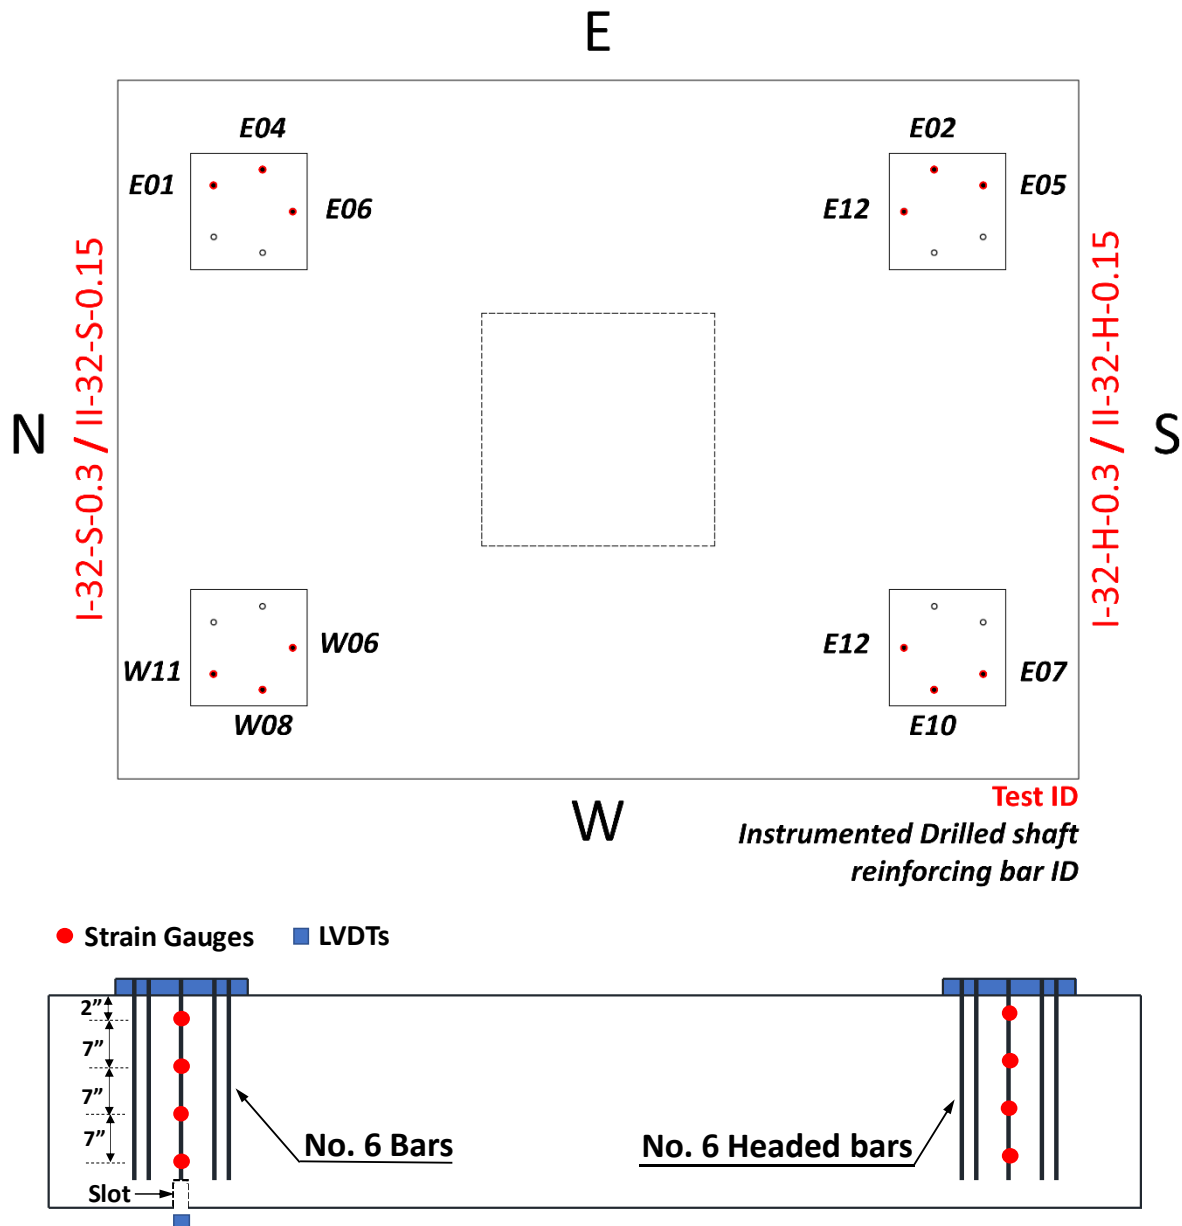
Strain gauge positions installed at drilled shaft reinforcement
